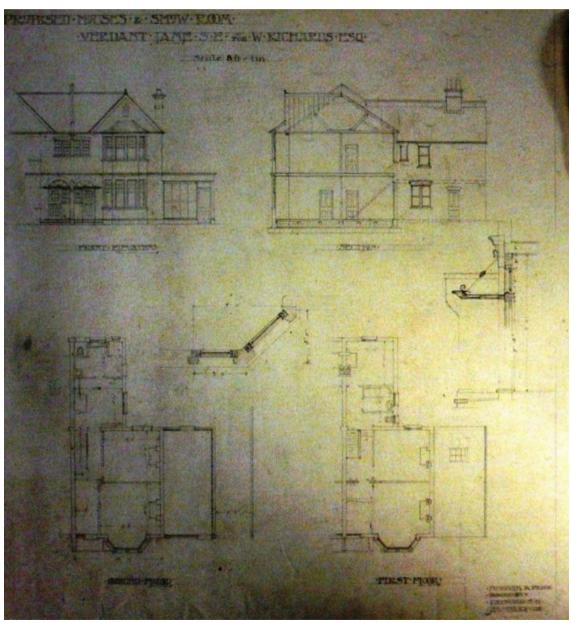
Drawing by Stone of above houses in Verdant Lane, 1908. For these houses, Stone varied the elevations already adopted for Ravensbourne Park and for Eliot Park; the houses have stone or concrete, rather than timber bays, but without stucco decorations (Prior collection, Item 1538).
